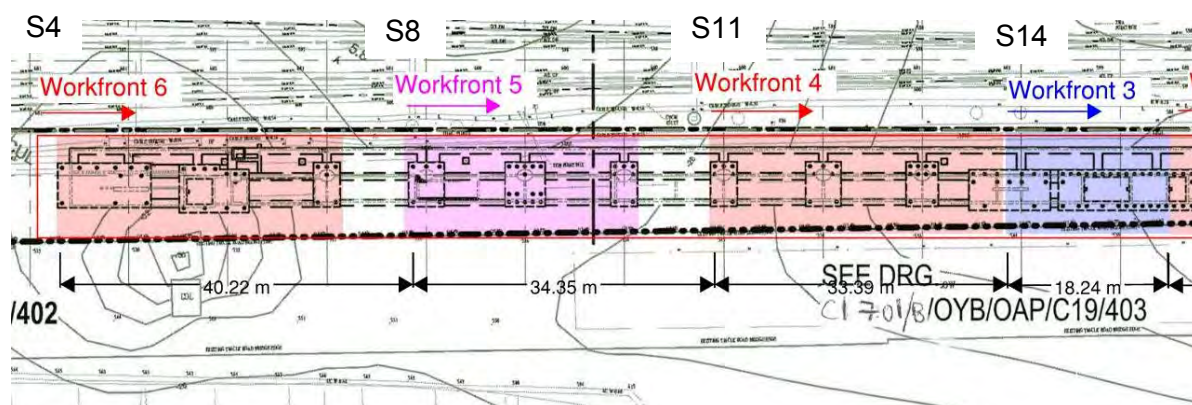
Mini-Pile Layout Plan (1)
